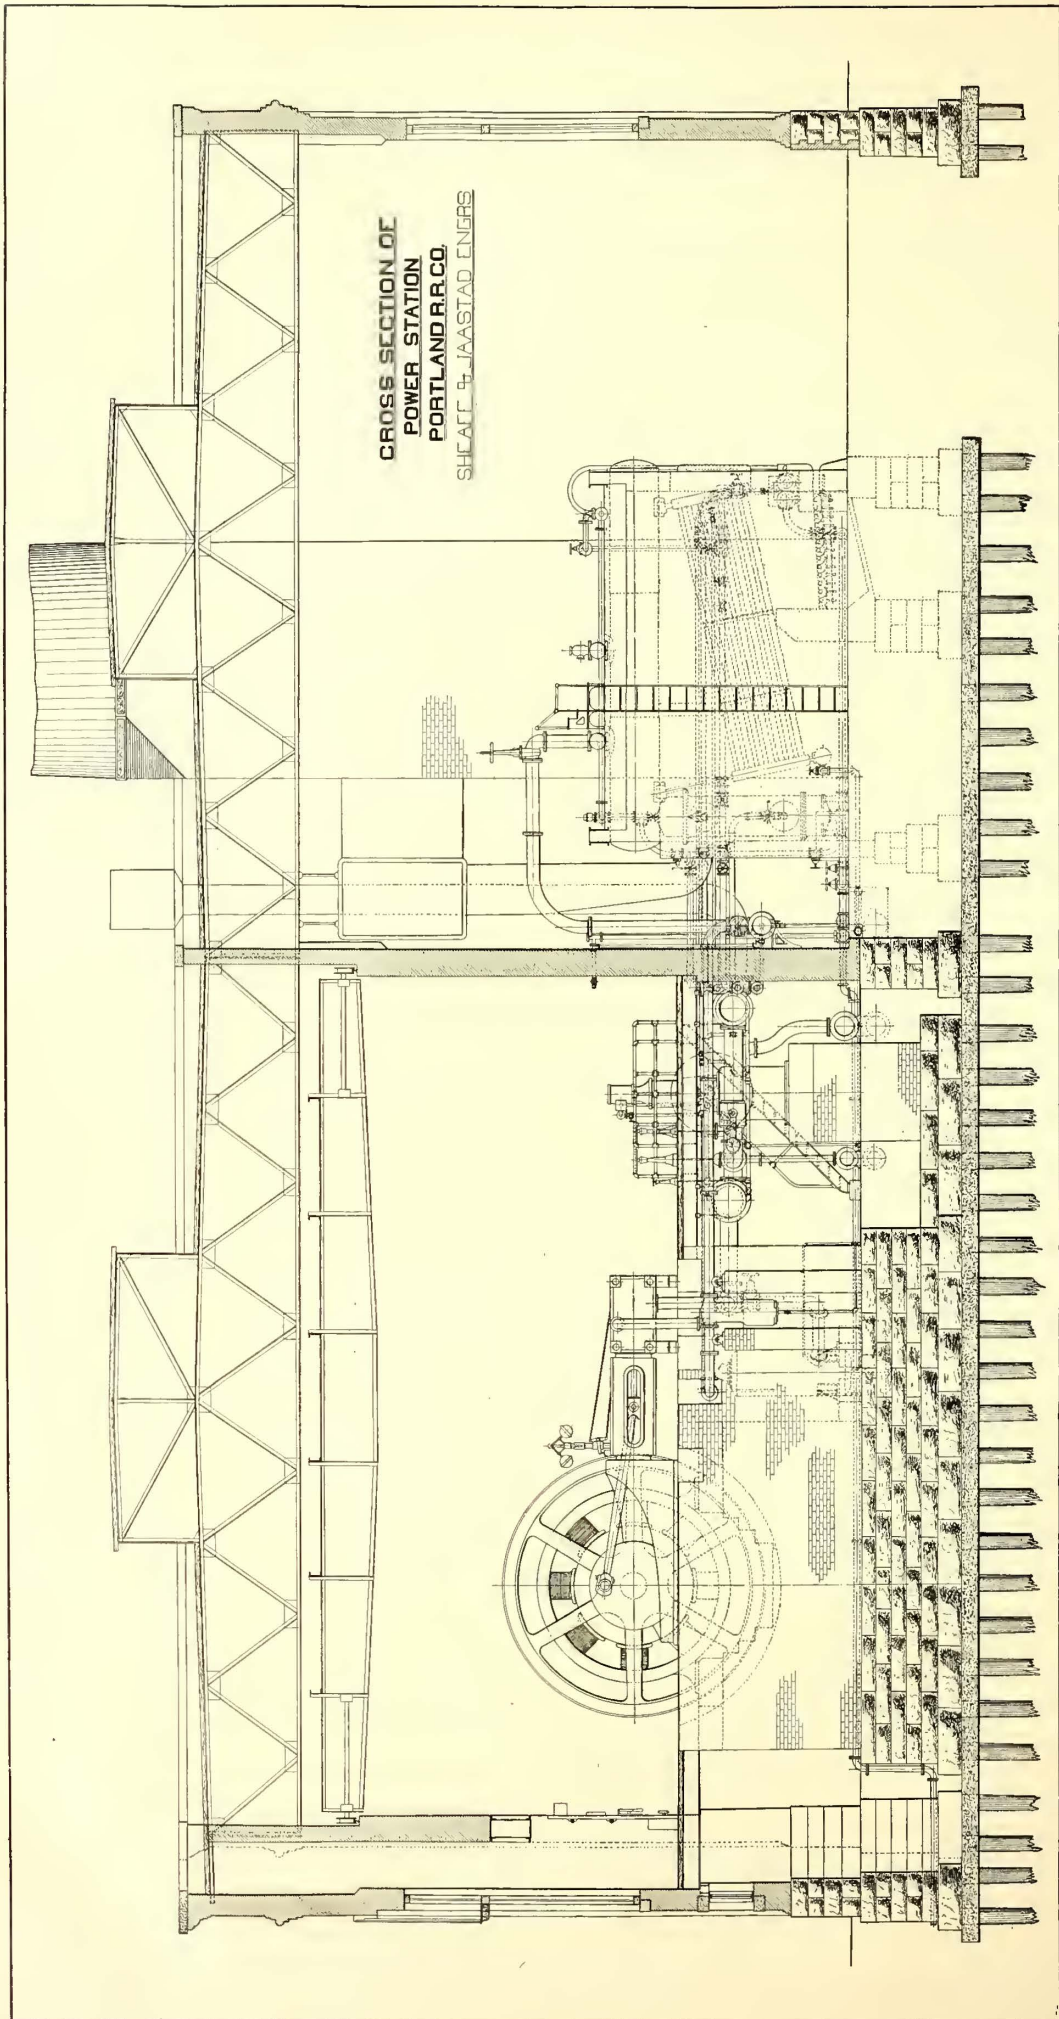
SECTION OF POWER STATION.—PORTLAND.
